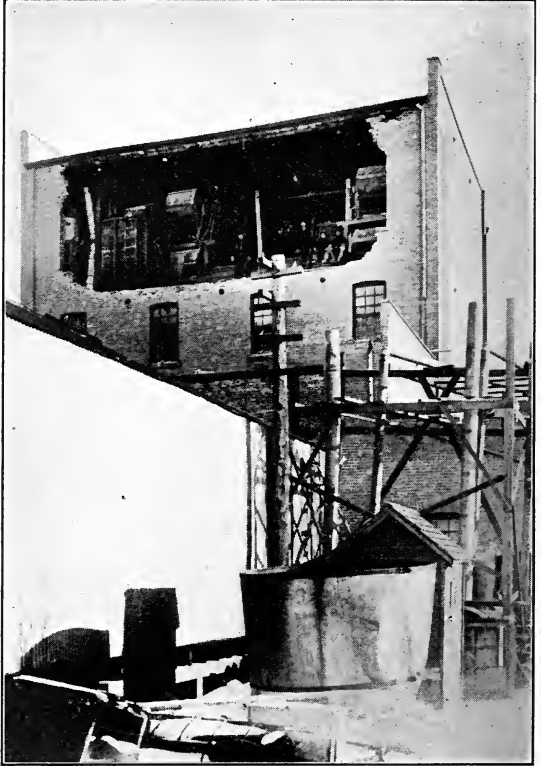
Explosion blew out wall of upper floor after propagating from floor below.
